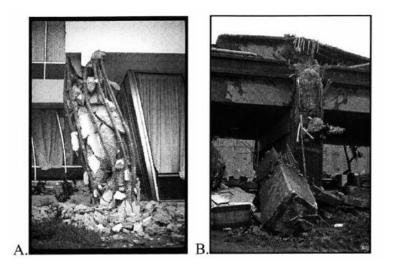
Representation of piers and columns collapse (Techniques of Seismic Strengthen for concrete structures)
